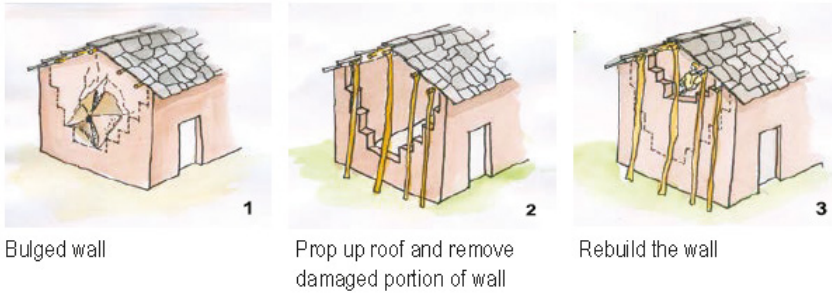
Steps of rebuilding a wall with out-of-plane failure (Government of Nepal National Reconstruction Authority, 2021)
